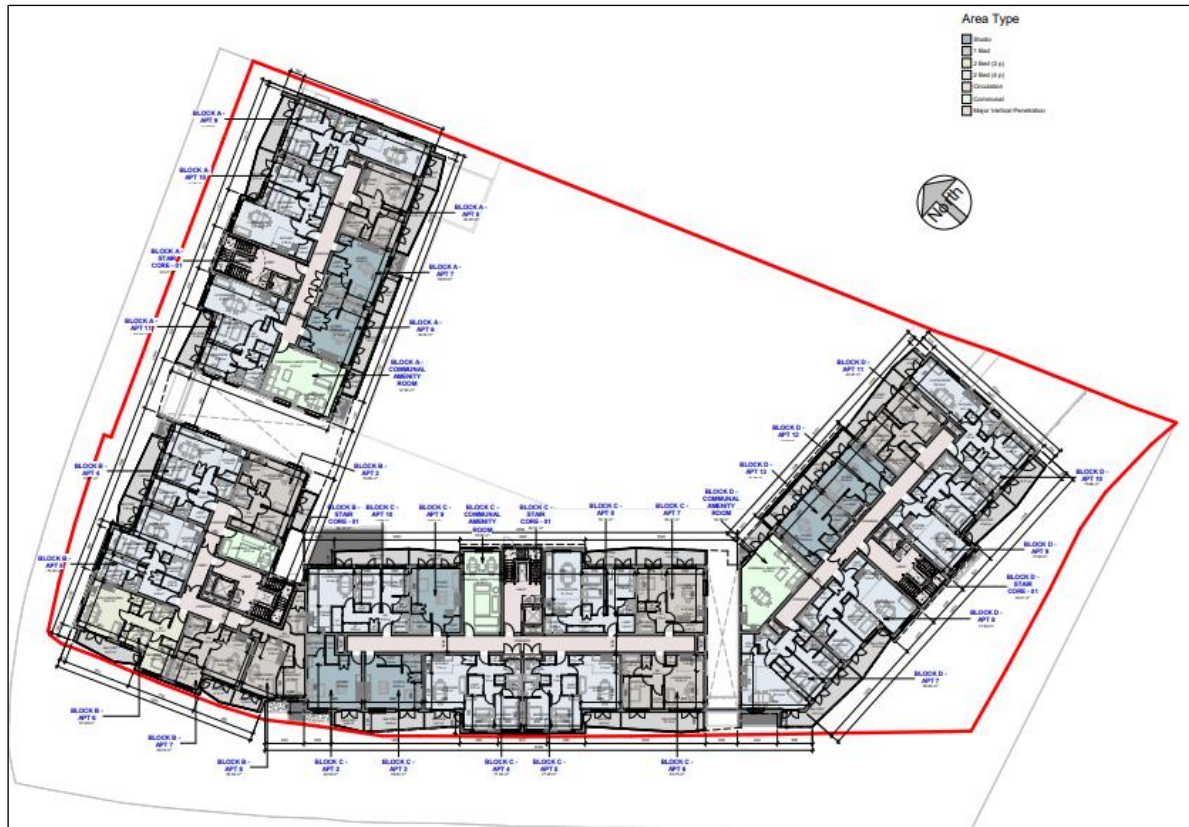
First floor plan of development approved under ABP Ref. No. 303803-19
